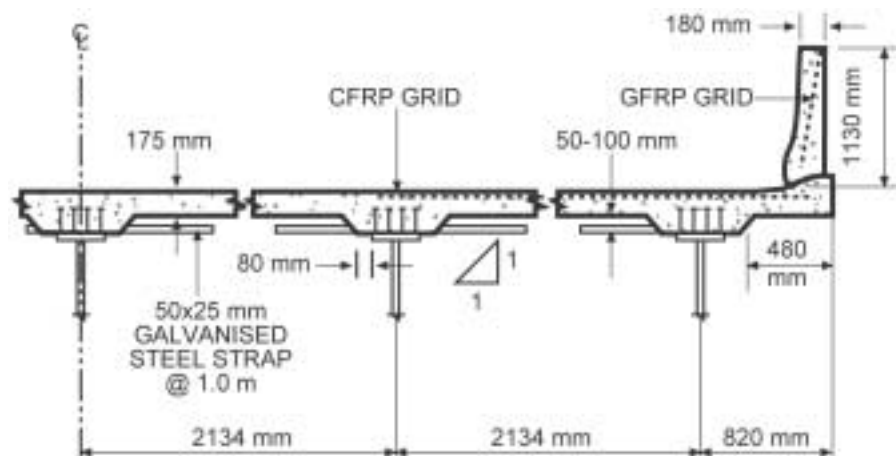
Half cross-section of steel-free deck slab of the Chatham Bridge
